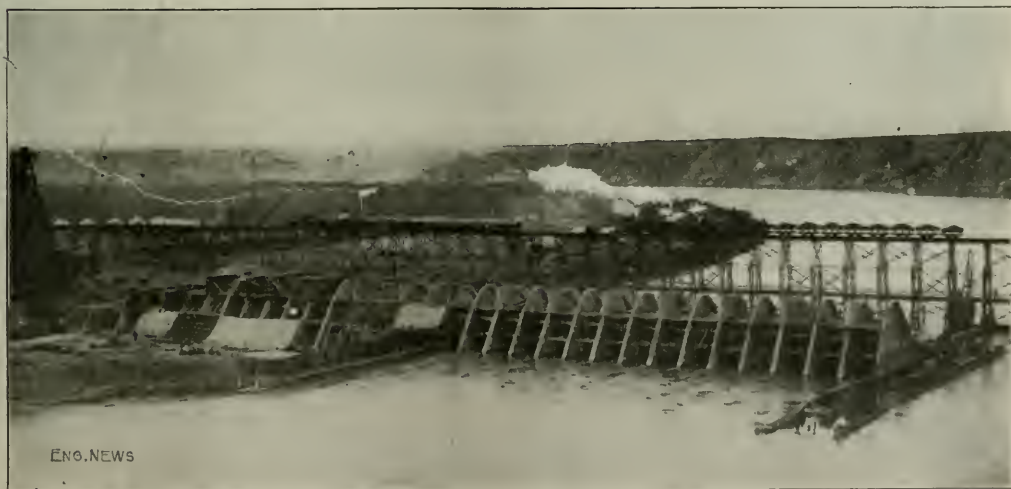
BASSANO DAM UNDER CONSTRUCTION, AUG. 1, 1911
